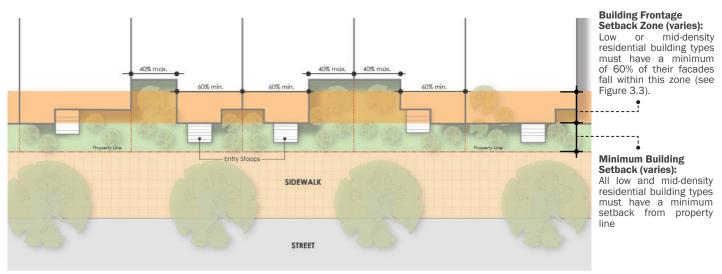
BUILDING FRONTAGE REQUIREMENT PER BLOCK
